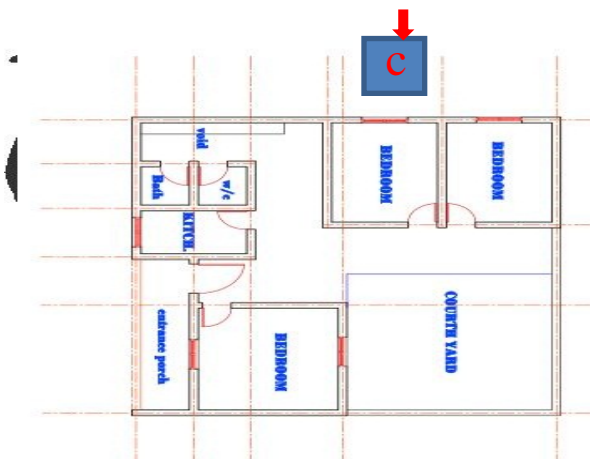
Floor plan of pilgrim's accommodation in Kano transit Hajj camp with good functional space arrangement.
